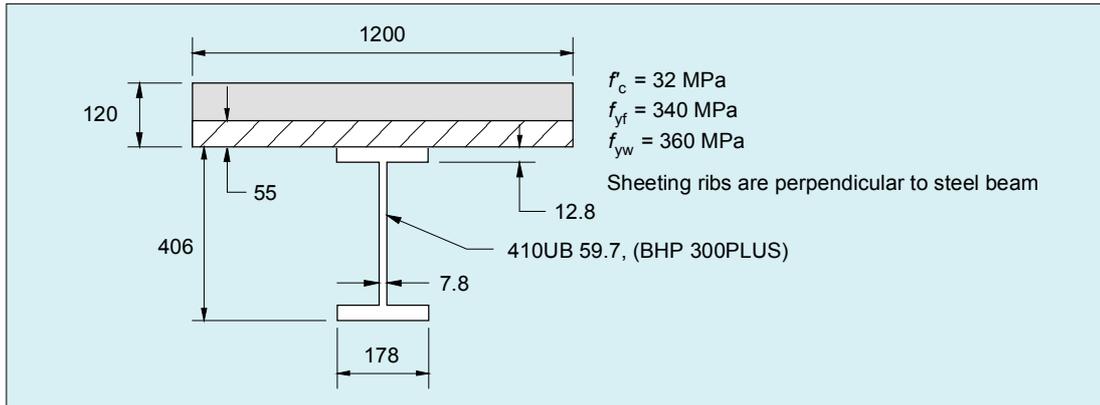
Composite Beam Cross-section - Examples 7.5-1 and 7.6-1
